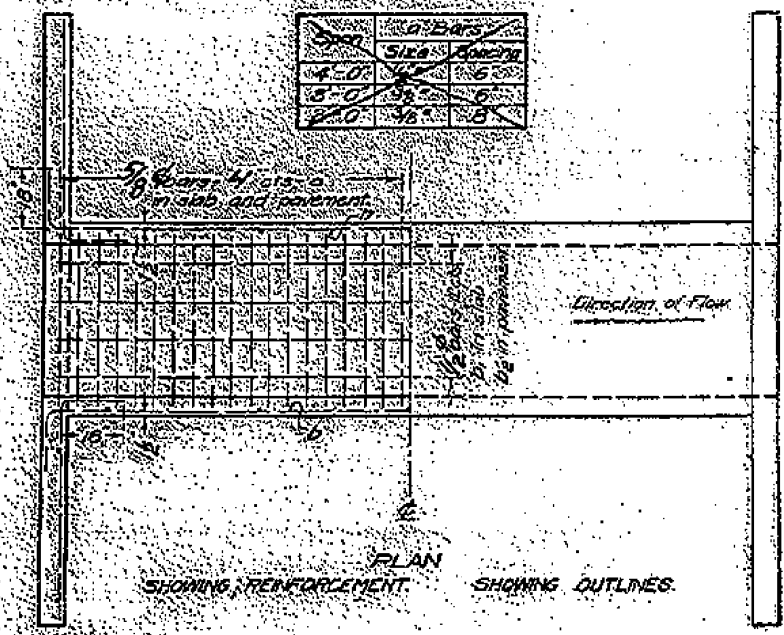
DETAIL OF EXISTING REINFORCED BOX CULVERT SN 021-8028
